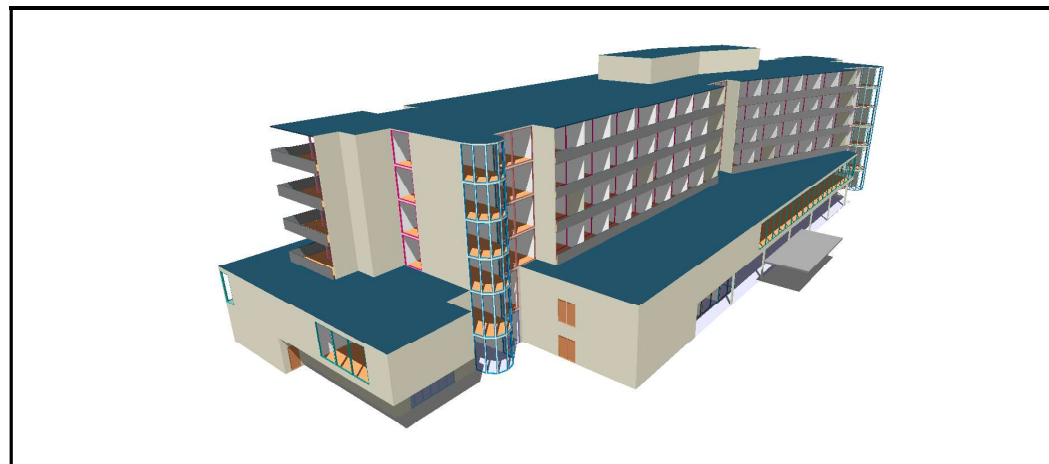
Proposed Hotel Roof Level Plant Area
